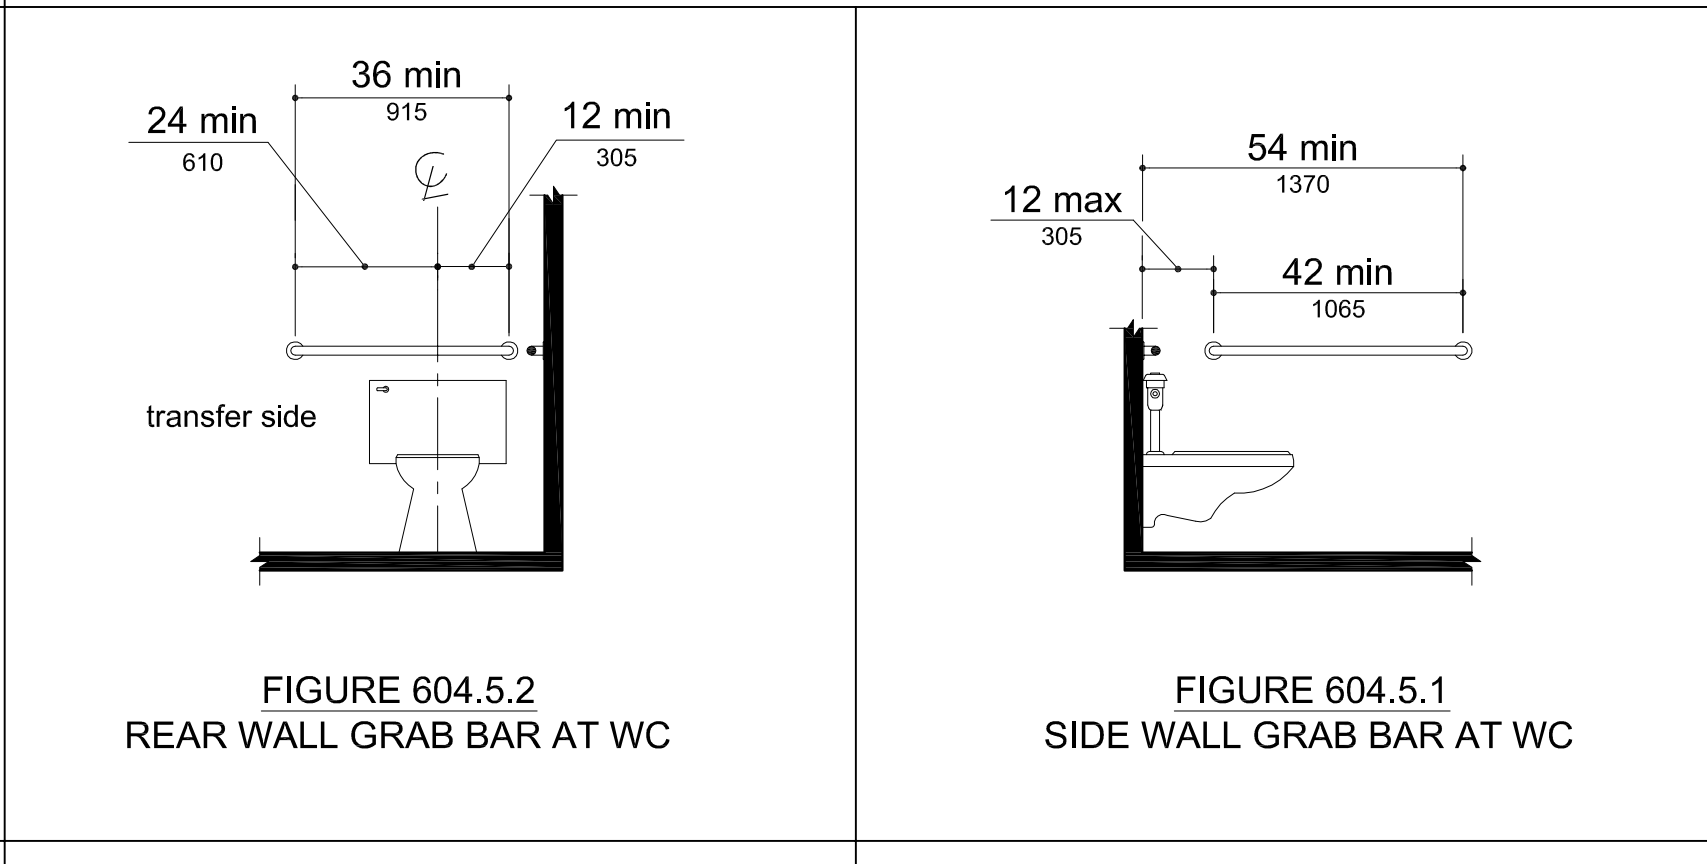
SIDE WALL GRAB BAR AT WC
